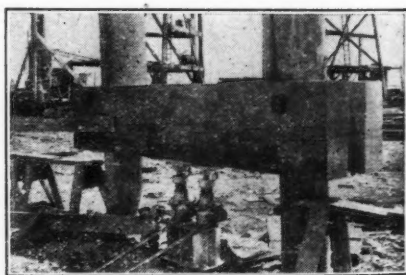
SETUP FOR WOOD PILE LOADING TEST
